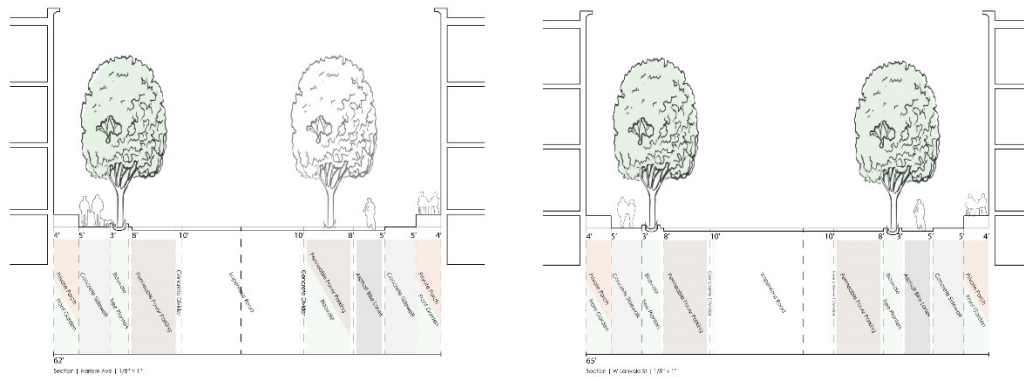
(left): Street section and kit-of-parts, 62' wide road with bike lane.
